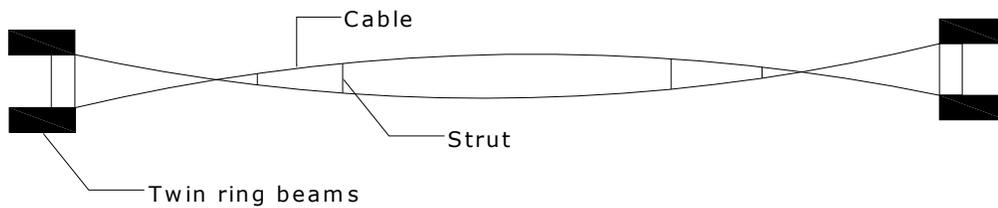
Double layer cable-intermediate shape for circular buildings
